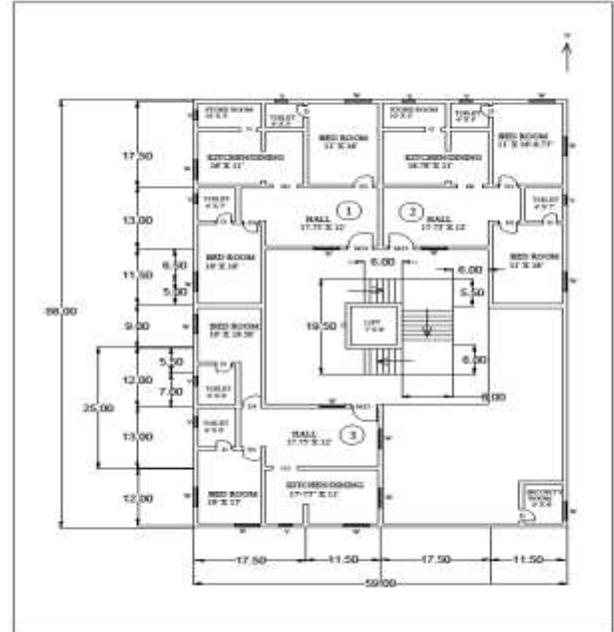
Irregular building typical floor plan by using AutoCad
